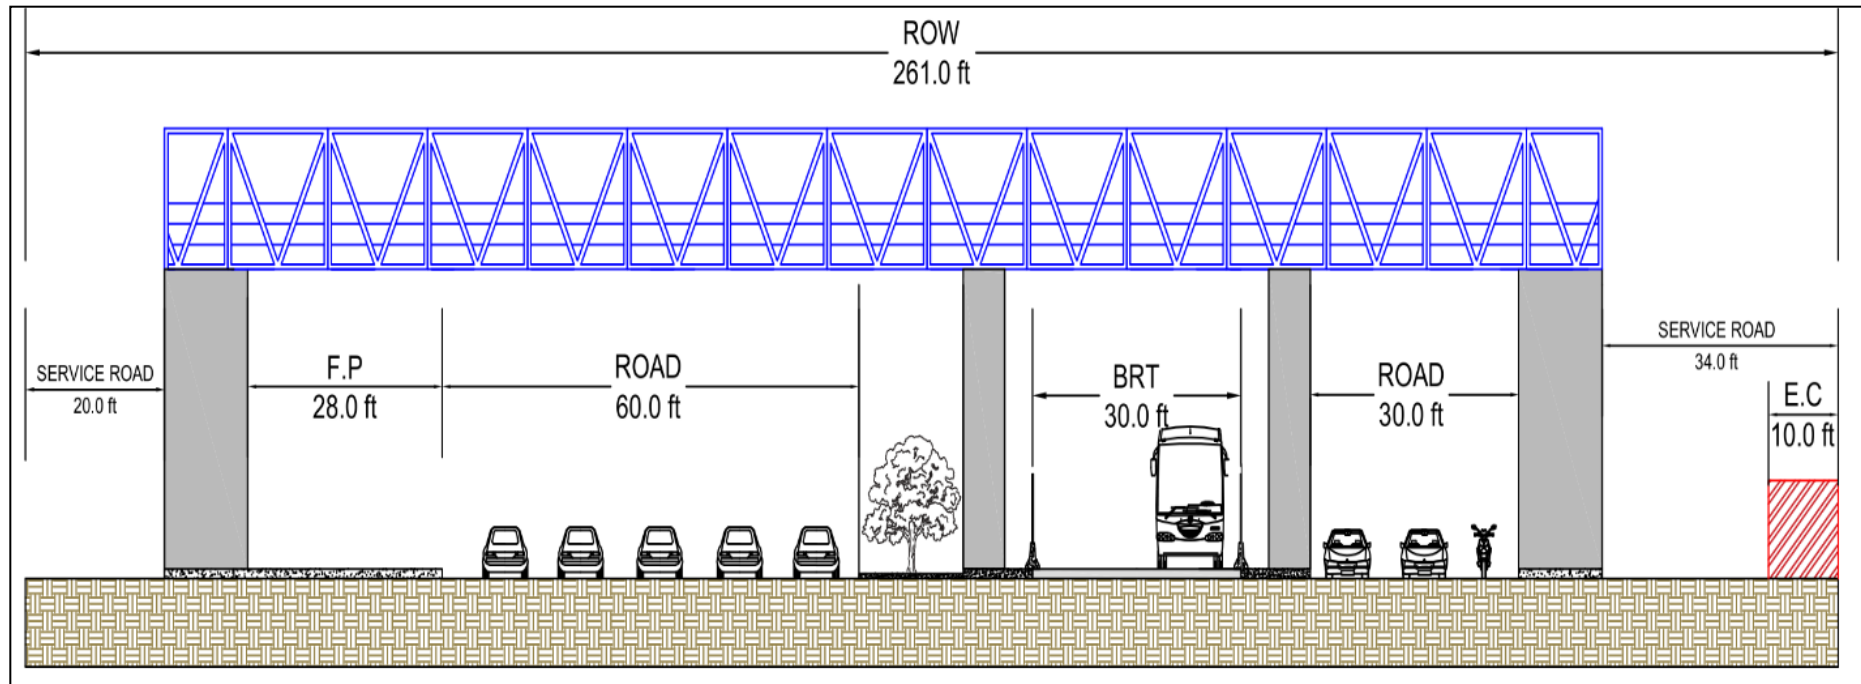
Cross-section of Nagan Chowranghi BRT Station
